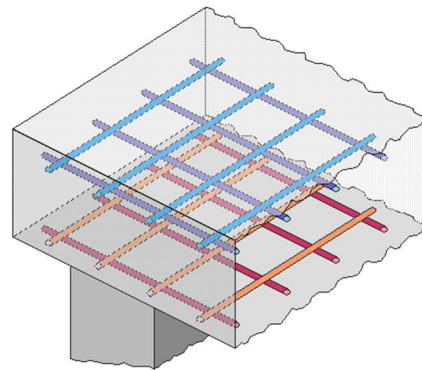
Torsion reinforcement (The Concrete Centre, 2017)
